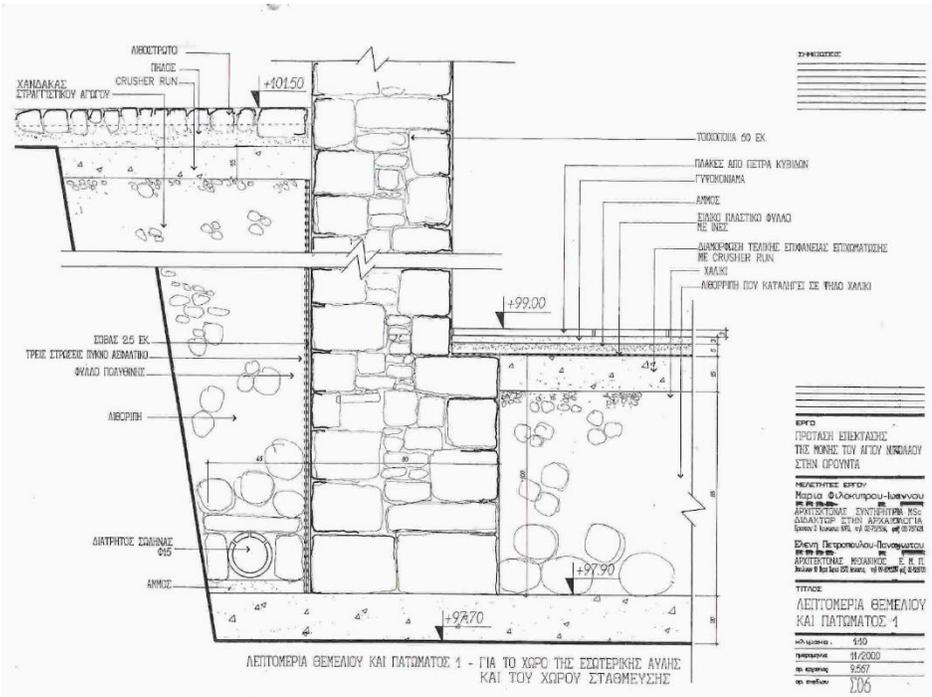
Sketch showing a trench outside a vernacular structure. ©Eleni Petropoulou
